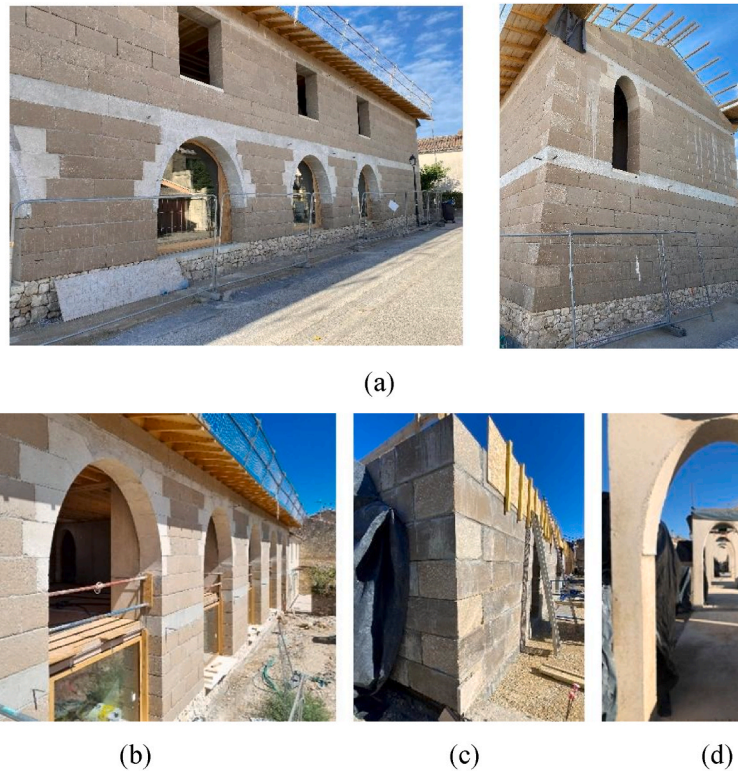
Pictures of the pilot project: (a) 3-story compressed earth block (CEB) masonry building; (b) building façade composed of CEB masonry walls and plum concrete arcs (lighter color); (c) interlocking masonry walls; (d) non-reinforced plum concrete cross-walls.
